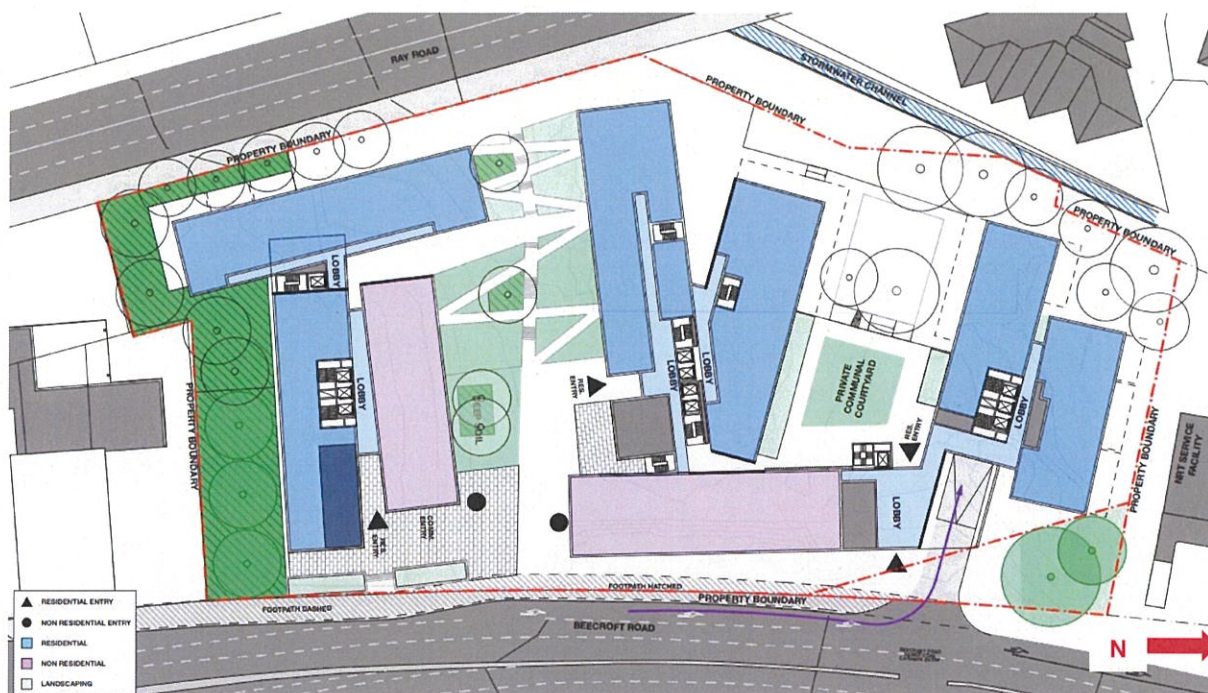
| Indicative ground floor layout (Source: Applicant's RtS)
